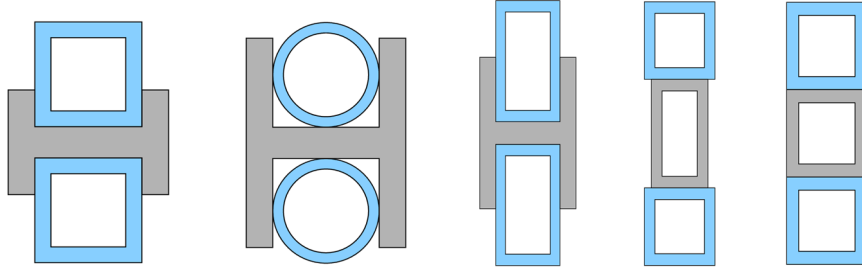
Example of several sandwich beam profiles built of three individual sub-beams.
